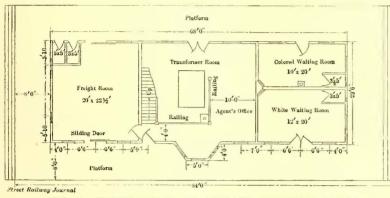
GROUND PLAN OF ASHLAND TERMINAL DEPOT
